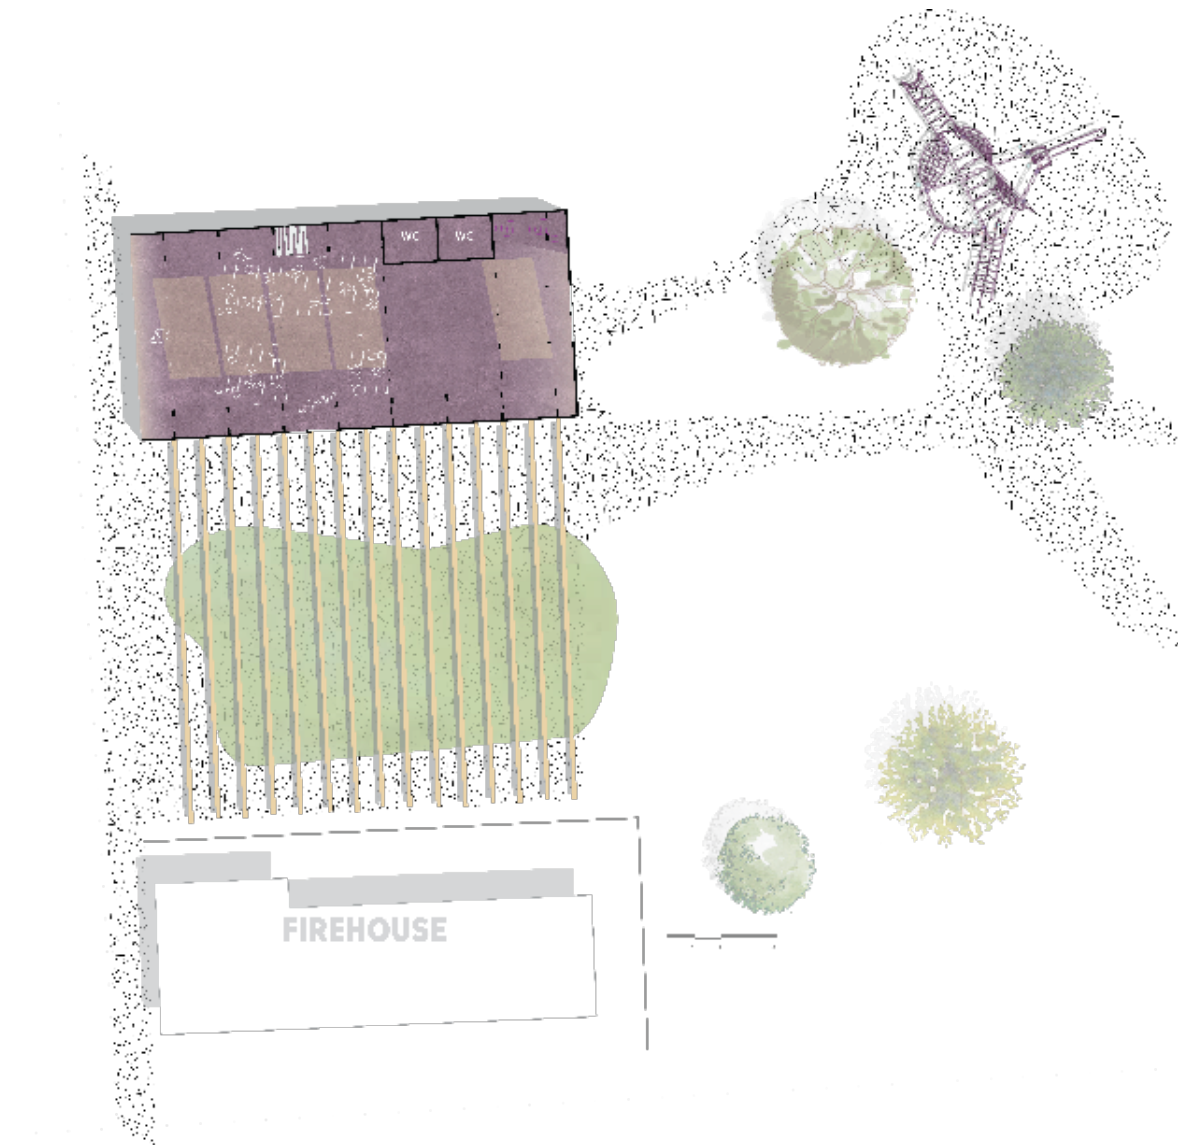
Proposed Rec Welcome Hall Floor Plan (created by author)
